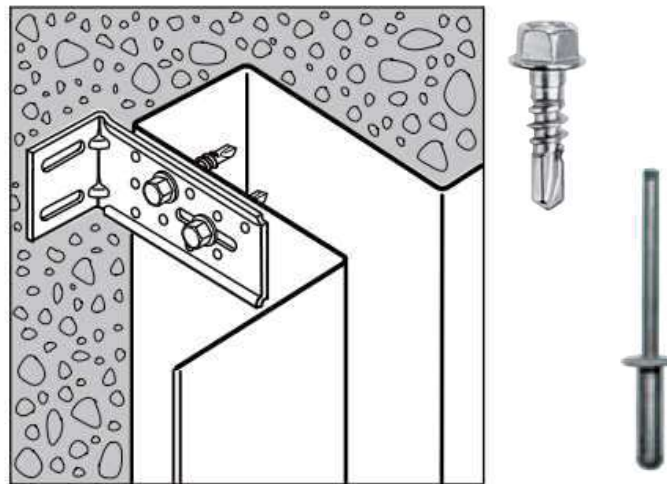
Fixing the galvanised steel profiles to the support brackets (screws of $\varnothing \geq 5.5$ or rivets of $\varnothing \geq 4.8$)
